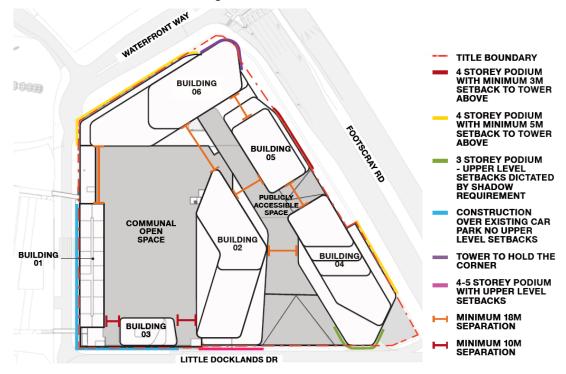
DP Addendum podium heights, tower setbacks and separation
